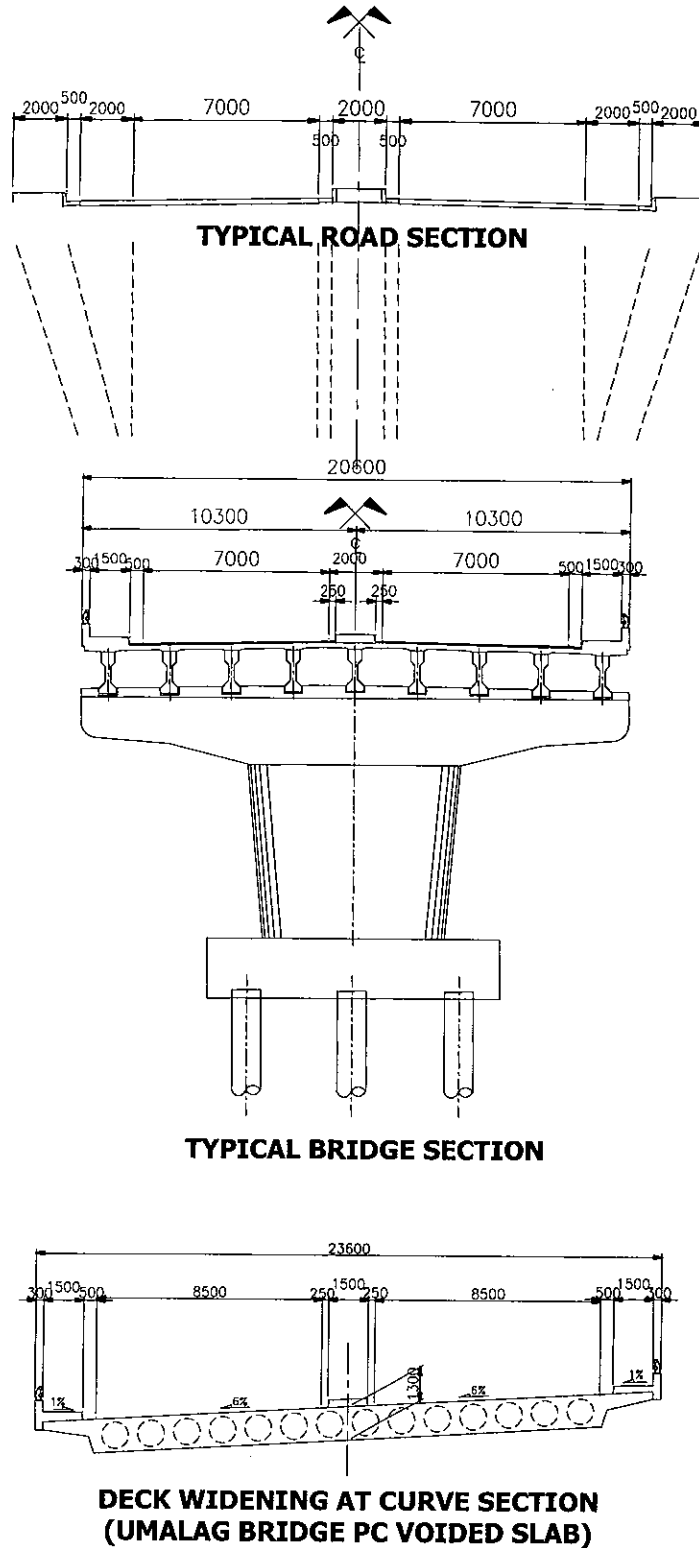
TYPICAL BRIDGE SECTION
